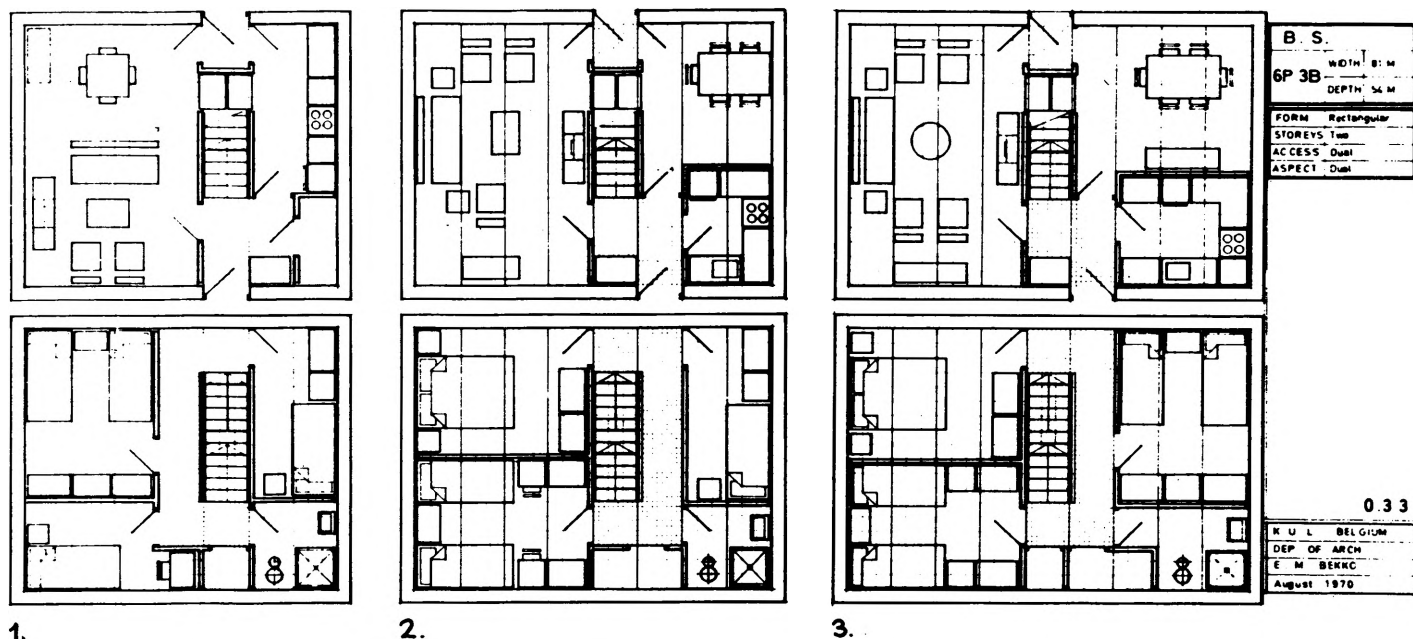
Two-storey house units, based on structural grid 900mm.
